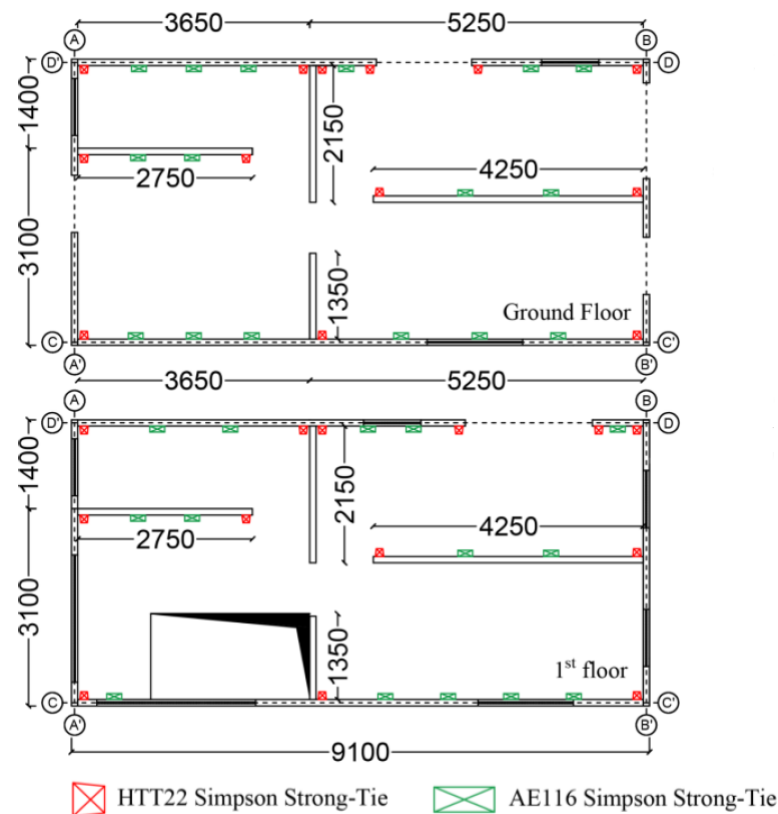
Geometry of the analysed building - ground and second pavements (dimensions in mm) (De MATOS, 2020).
